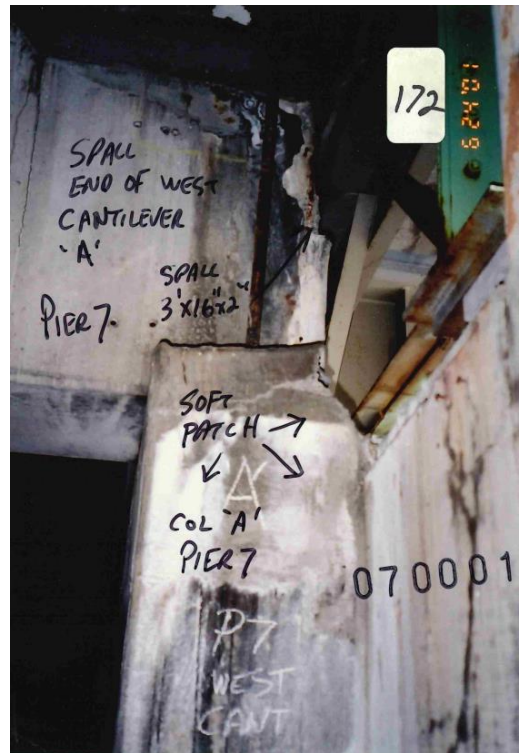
Inspection photo of exterior tie-down rod for cantilever beam A at Pier 7 taken June 2001 (RIDOT).
